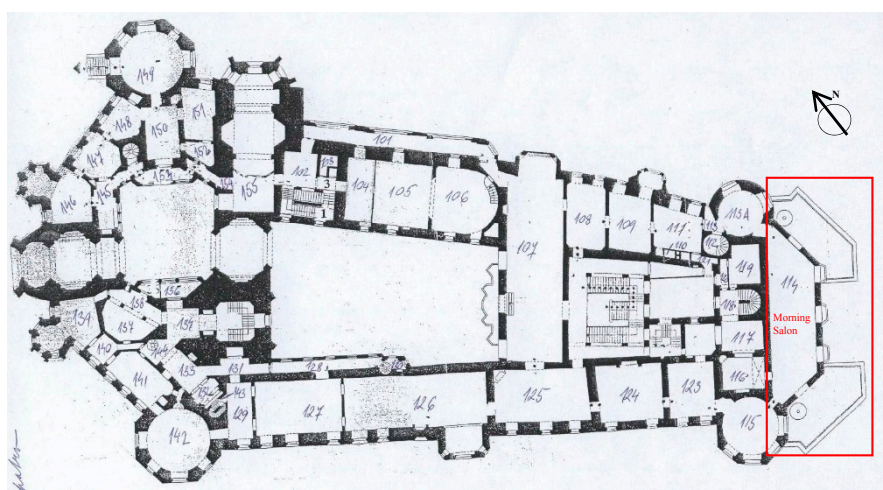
Plan of the first floor of the chateau with the Morning Salon (archive of the National Heritage Institute, Prague).
